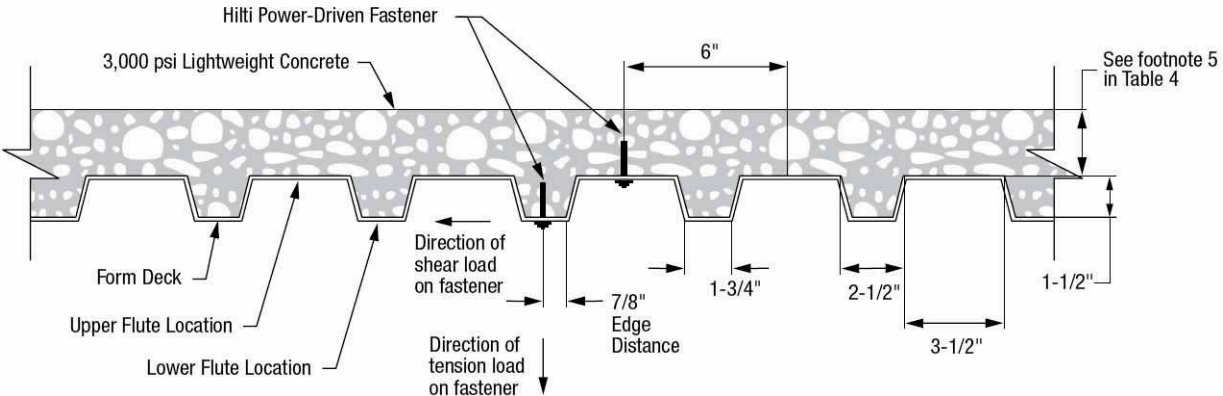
HILTI FASTENER INSTALLATION LOCATION IN 1 1/2-INCH-DEEP COMPOSITE FLOOR DECK
